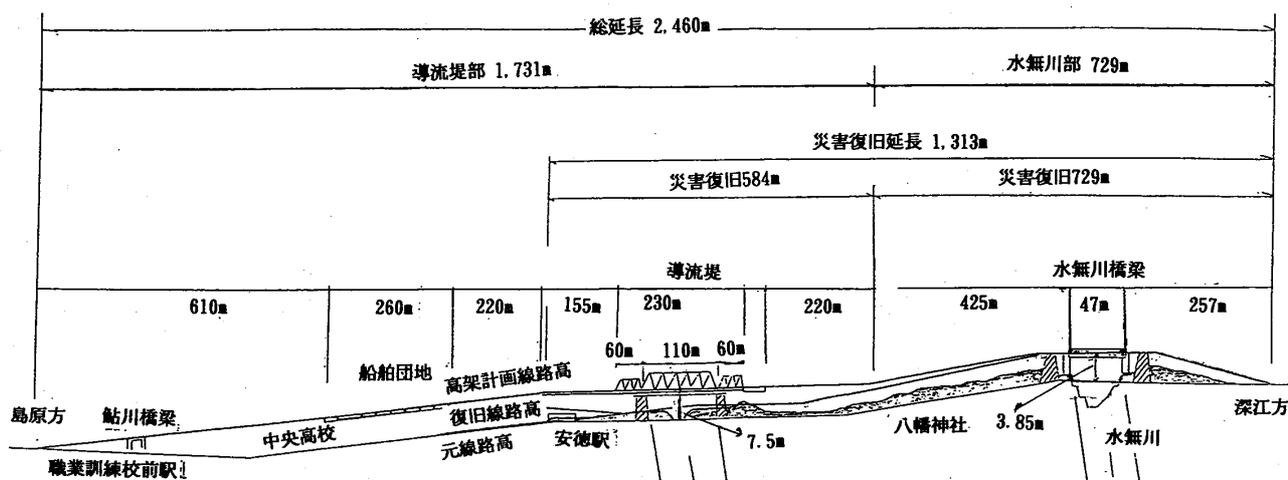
Mizunasi River improvement works and high-bridge building plan.
